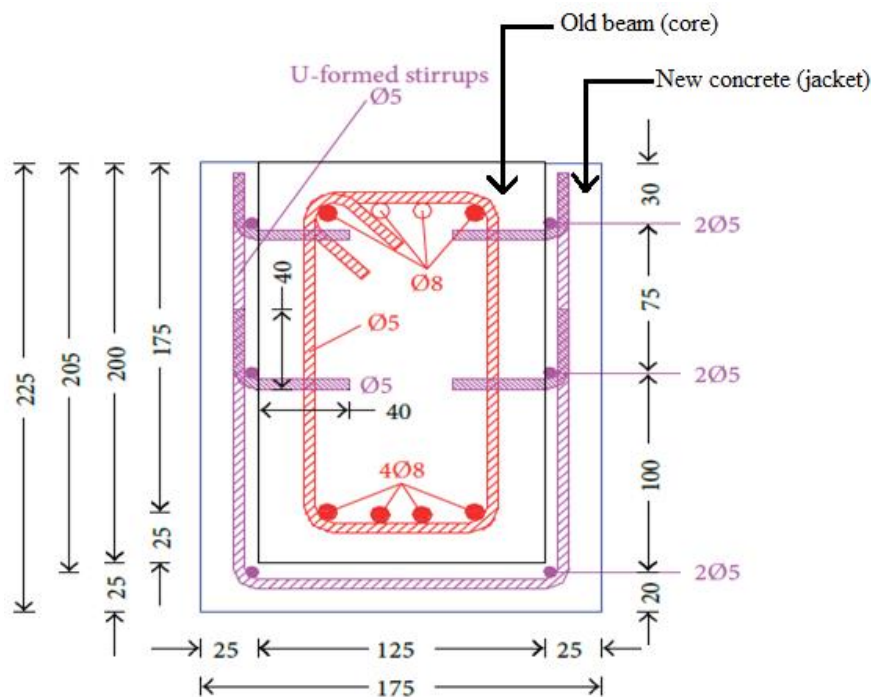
Cross-sectional dimensions and steel reinforcement of the jacketed beams (Chalioris, et al., 2013).
